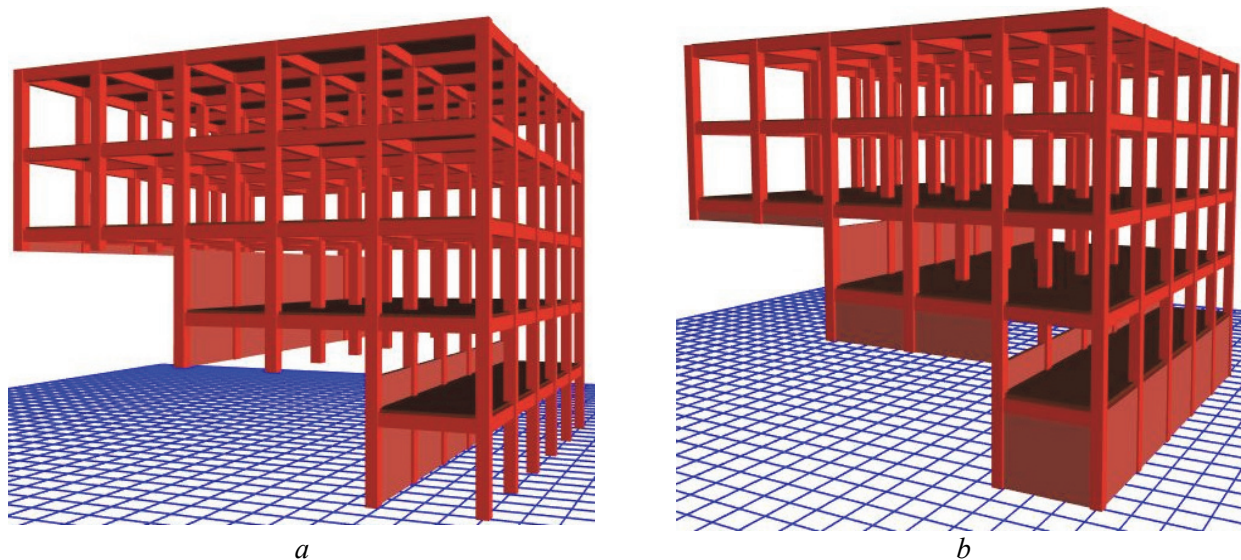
Shear wall in SBB: a – shear wall along earth pressure side only; b – shear wall along whole building
